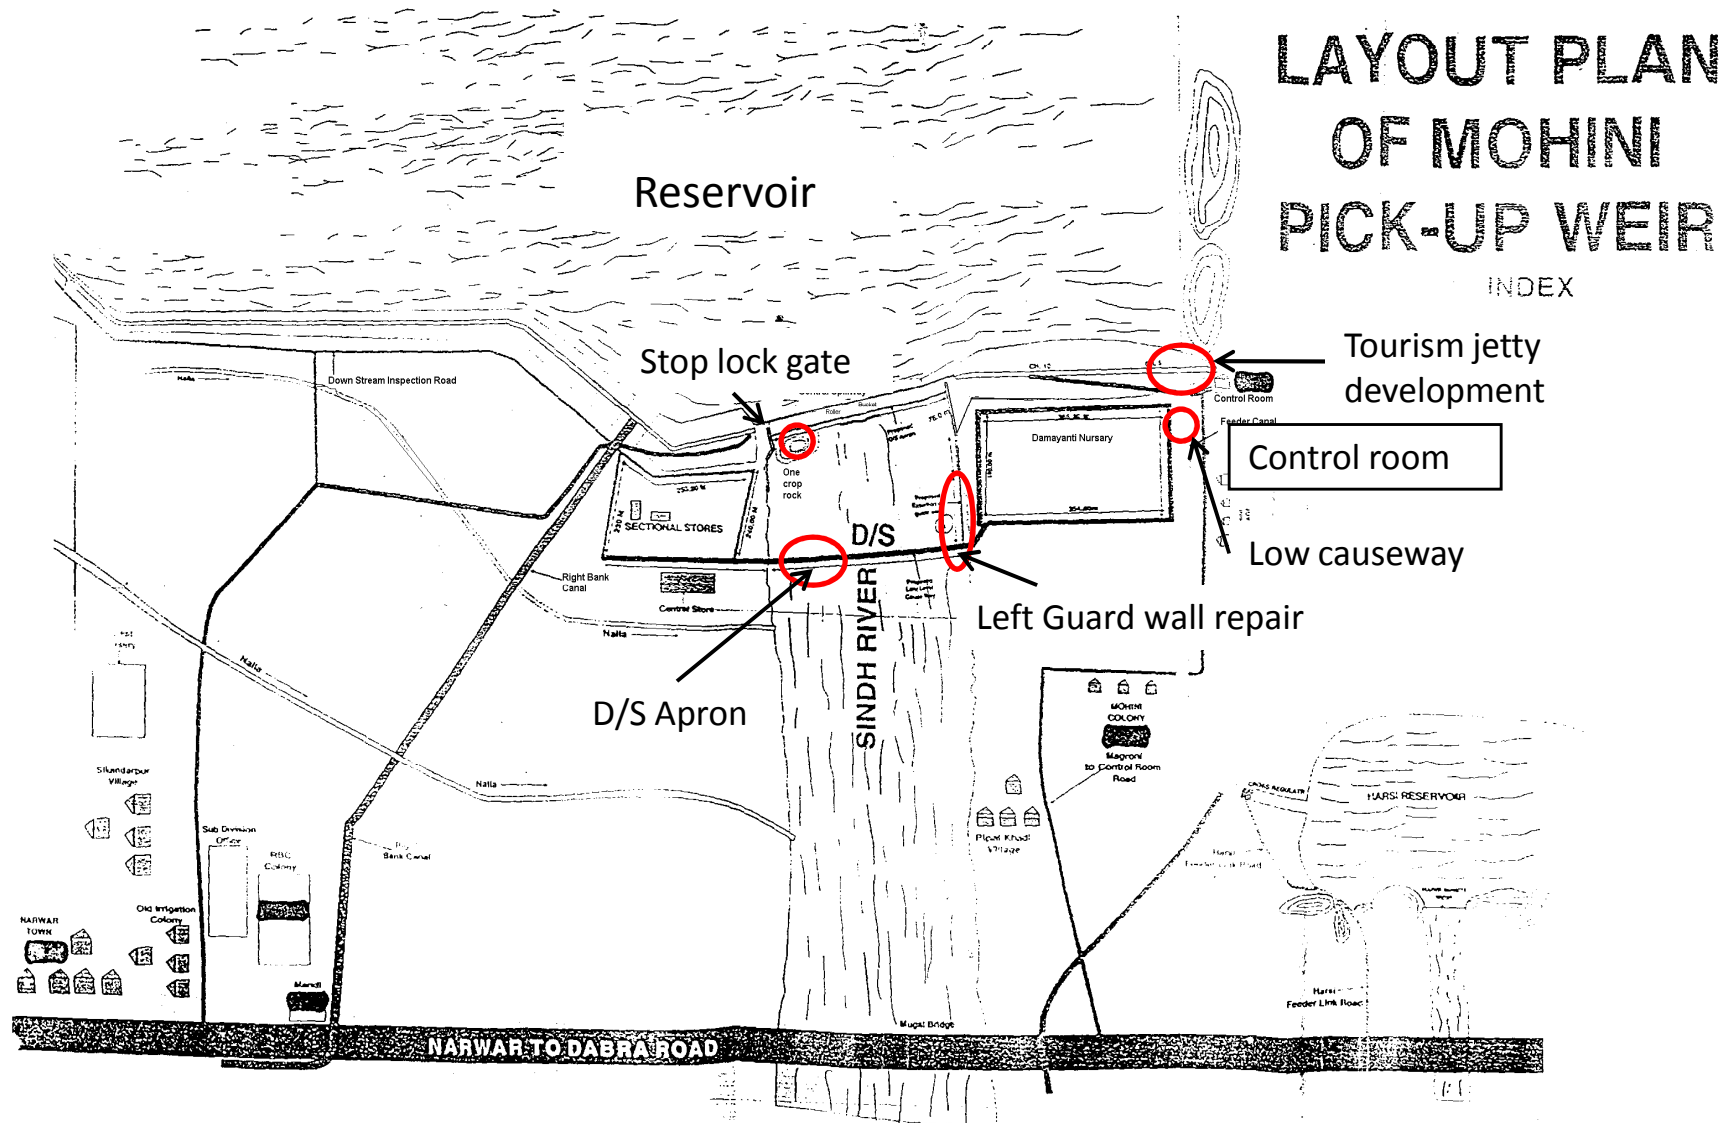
Layout Plan of Mohini Pick-up Weir
